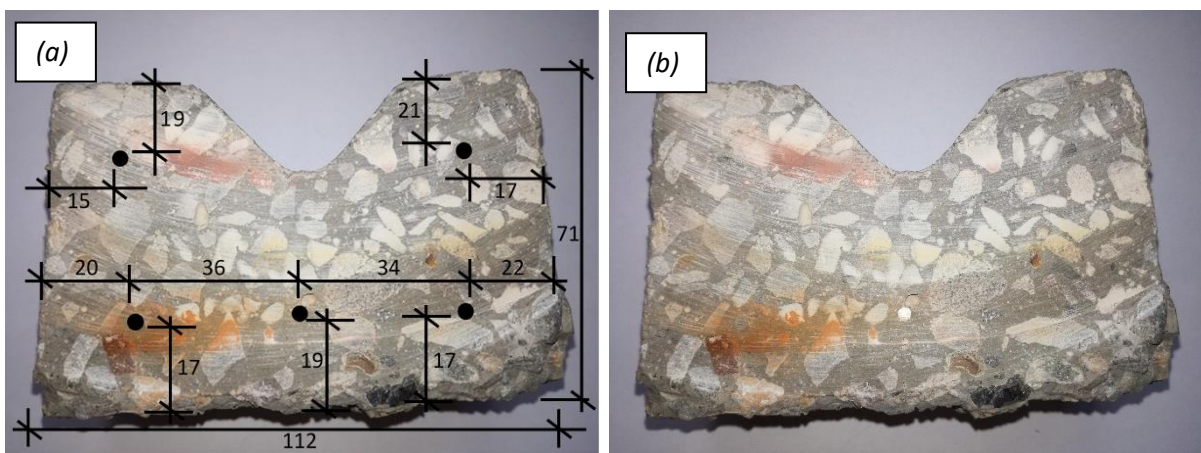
Photograph of (a) precast lintel cross section with dimension and (b) without dimensions.
